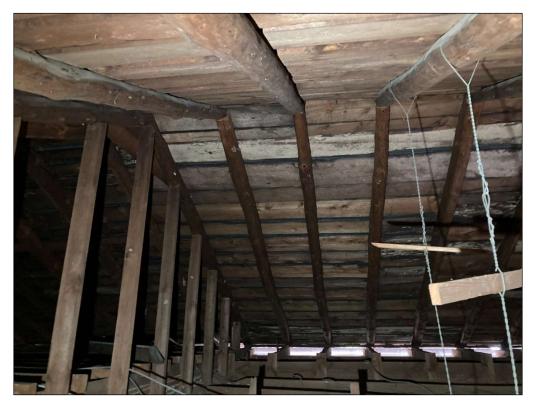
Attic above log section, looking up at ridge. May 2023. Photo by the author.
